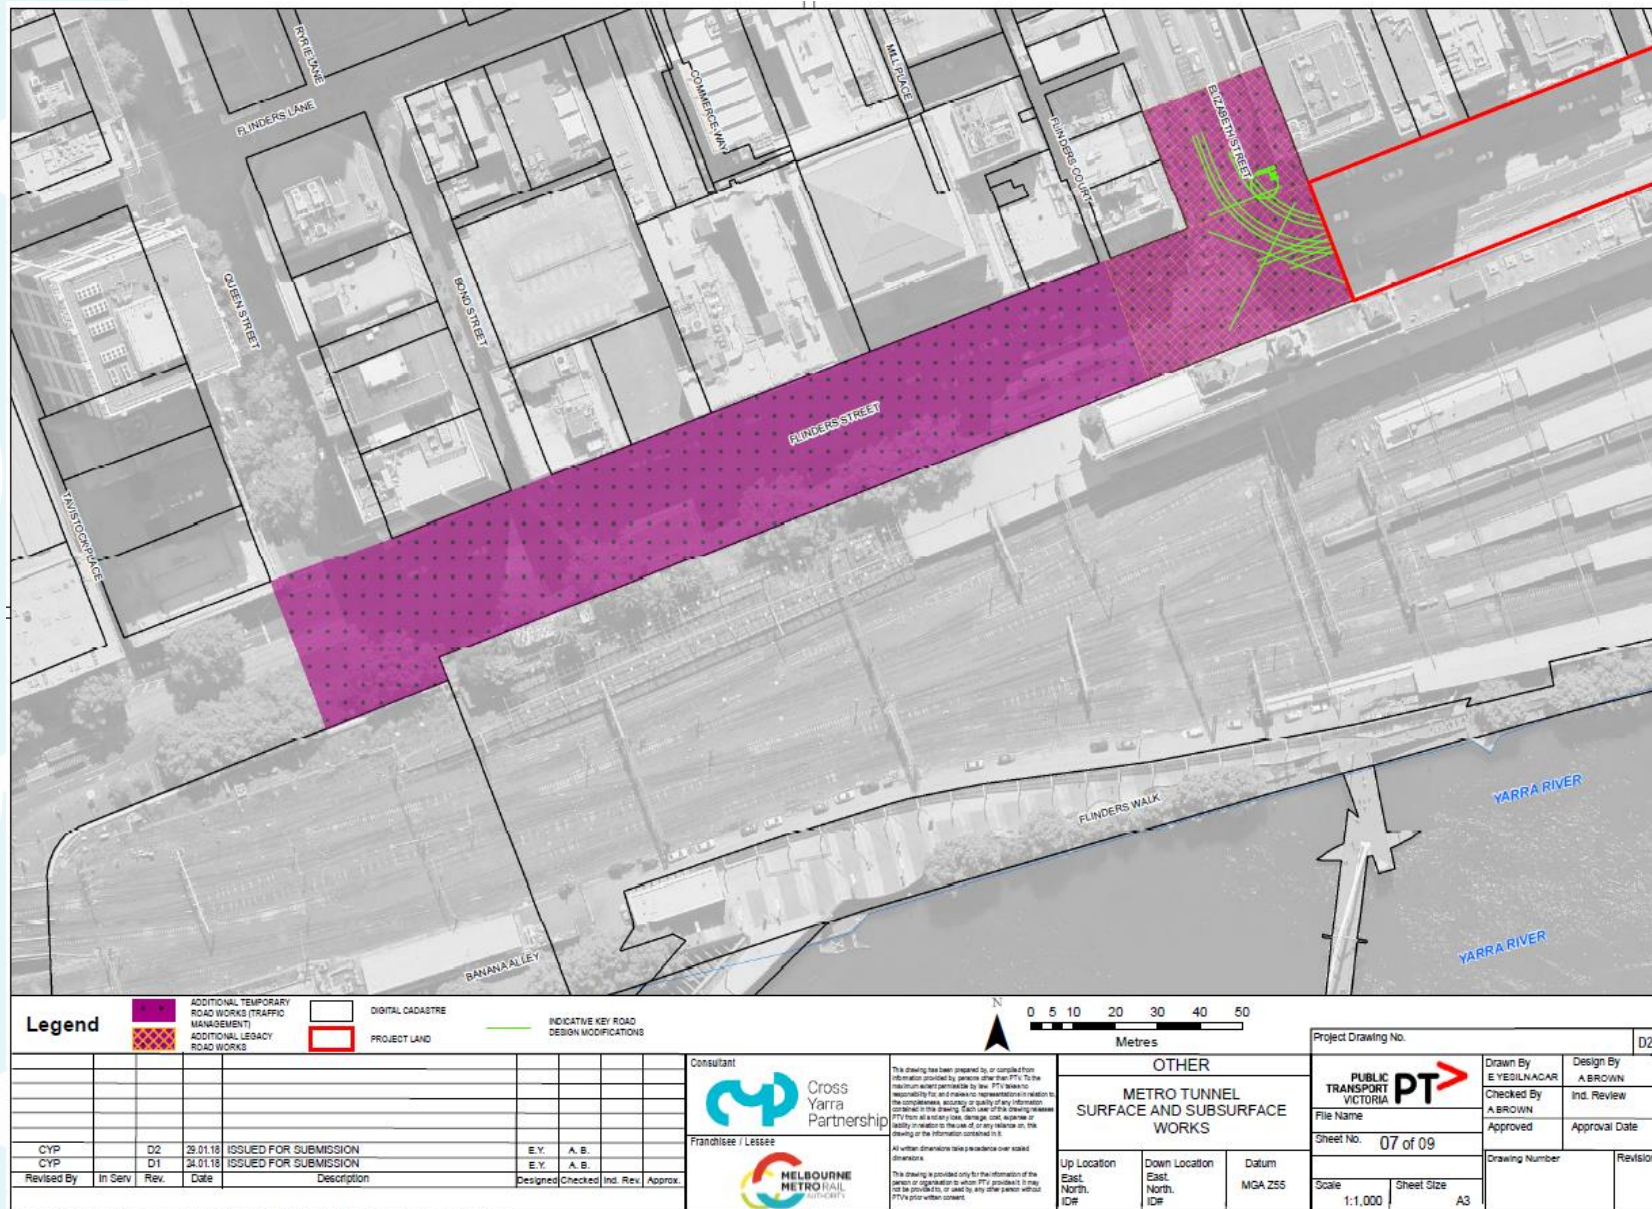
FLINDERS STREET ADDITIONAL ROAD SURFACE WORKS
